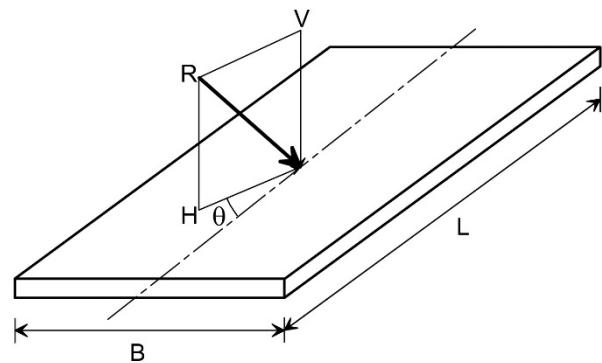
1—Inclined Loading Conventions
